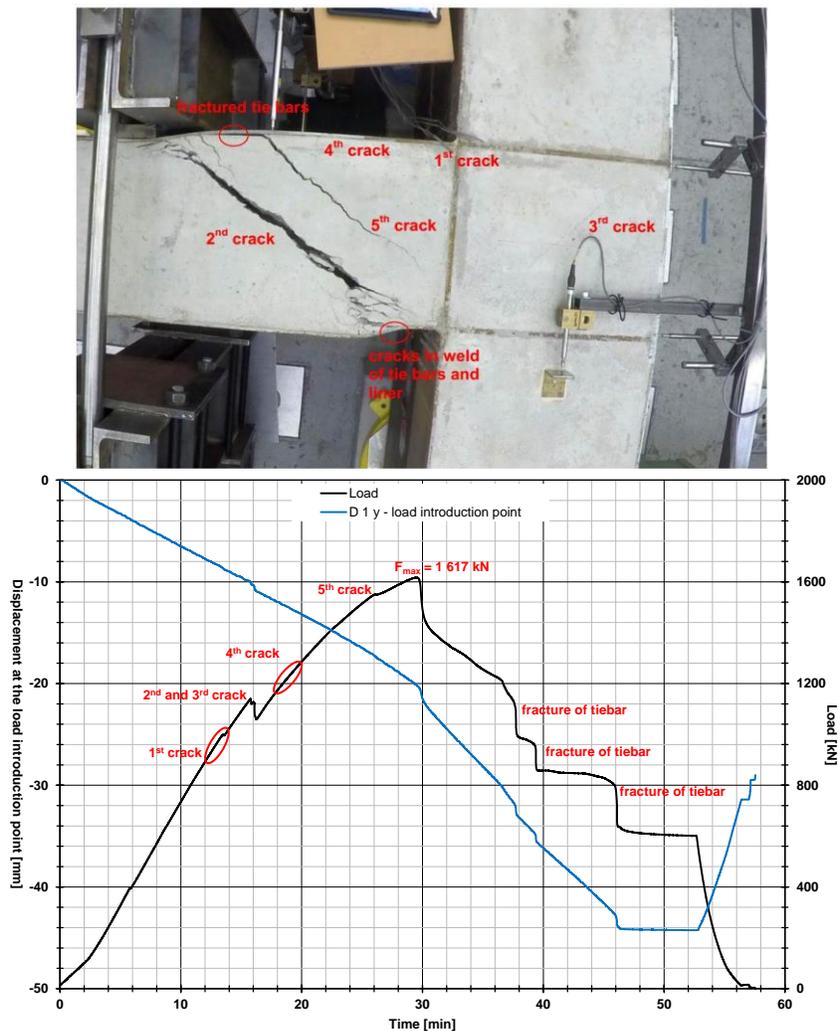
Wall to wall type II in shear loading at the end of the test (top) and loading curve (bottom)
